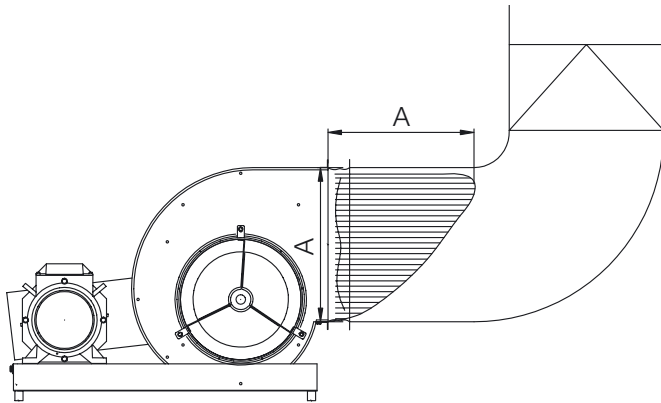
Minimum safe distance behind the outlet opening. Do not install an angle duct piece immediately after the fan outlet opening. Use a short, straight duct allowing the flow to equalise.
